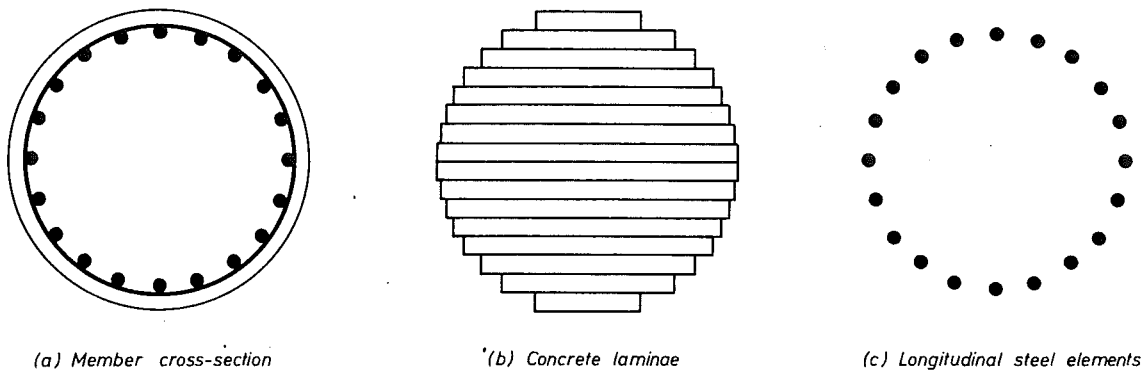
Discretization of member cross-section into concrete laminae and longitudinal steel elements
